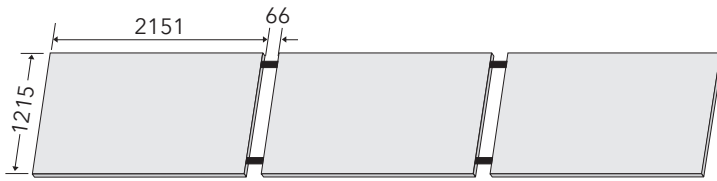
Field dimensions, without considering protruding connection parts on both outer sides
